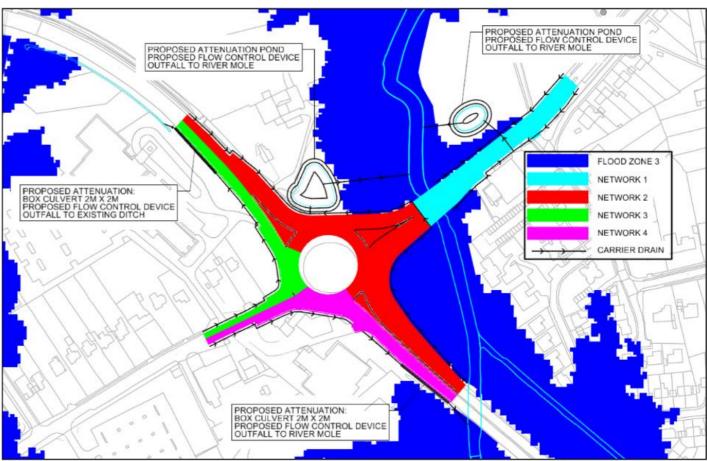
Proposed Drainage Layout - Longbridge Roundabout
